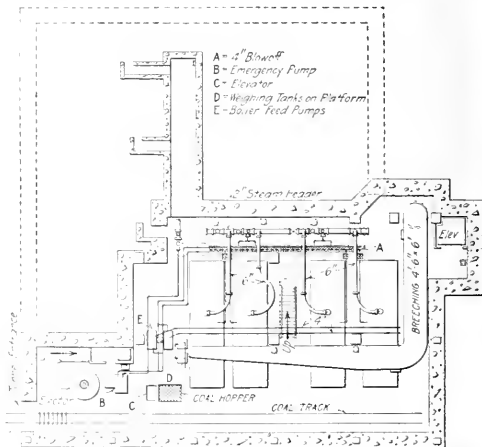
PLAN OF BOILER ROOM BELOW THE ENGINE ROOM
